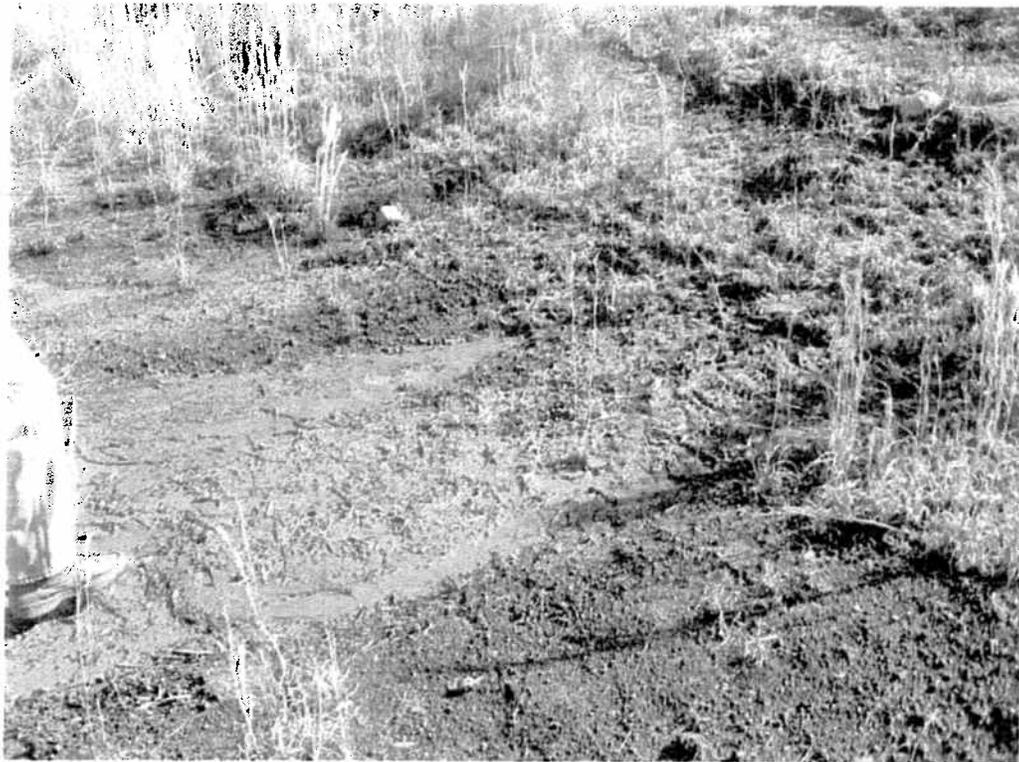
Typical Condition of Downstream Toe, West Dike
